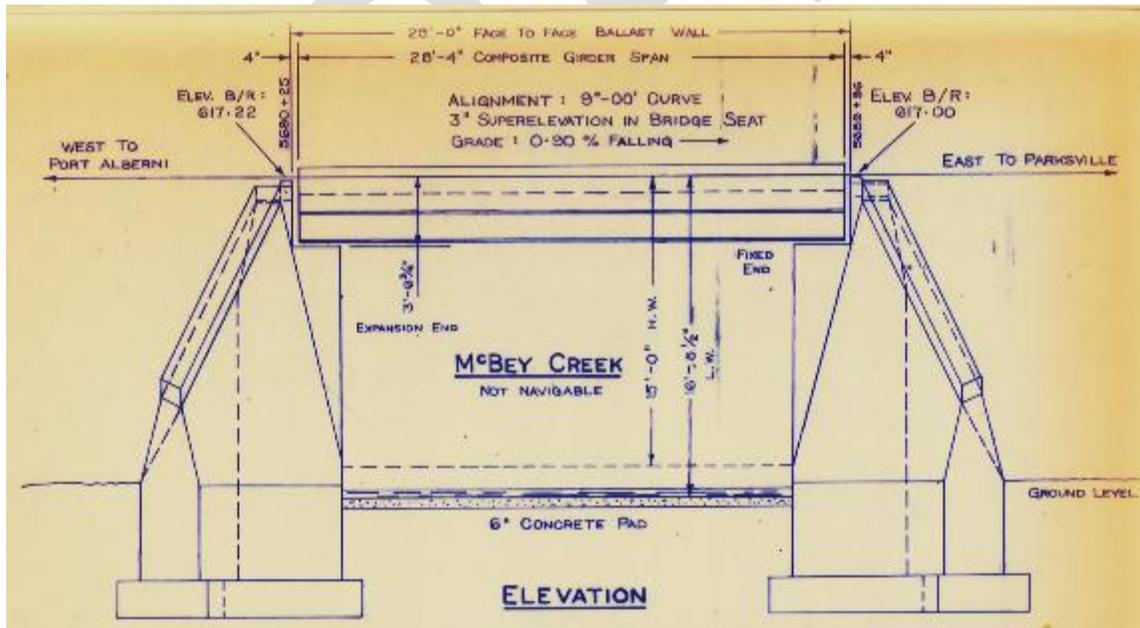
Bridge at Mile 12.3 – South Elevation
